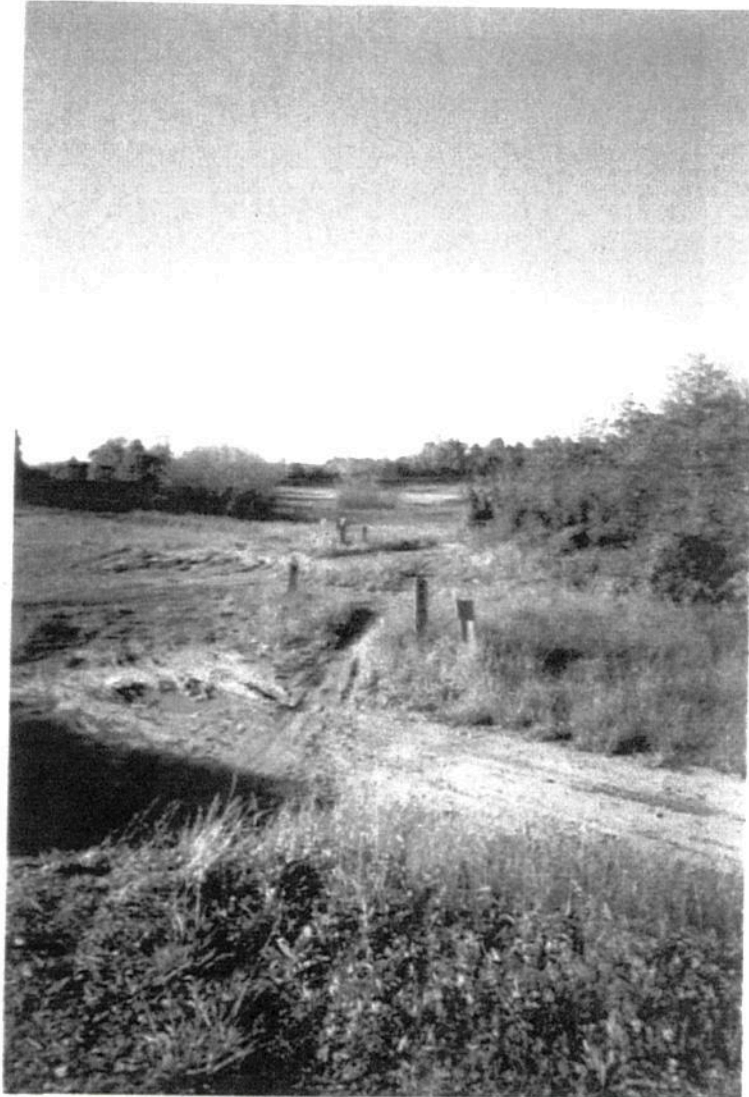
View of drainage channel crossing landfill at western end of capped area. Arrow points to northern outlet pipe that crosses under access road. Southern end of pipe could not be located.
